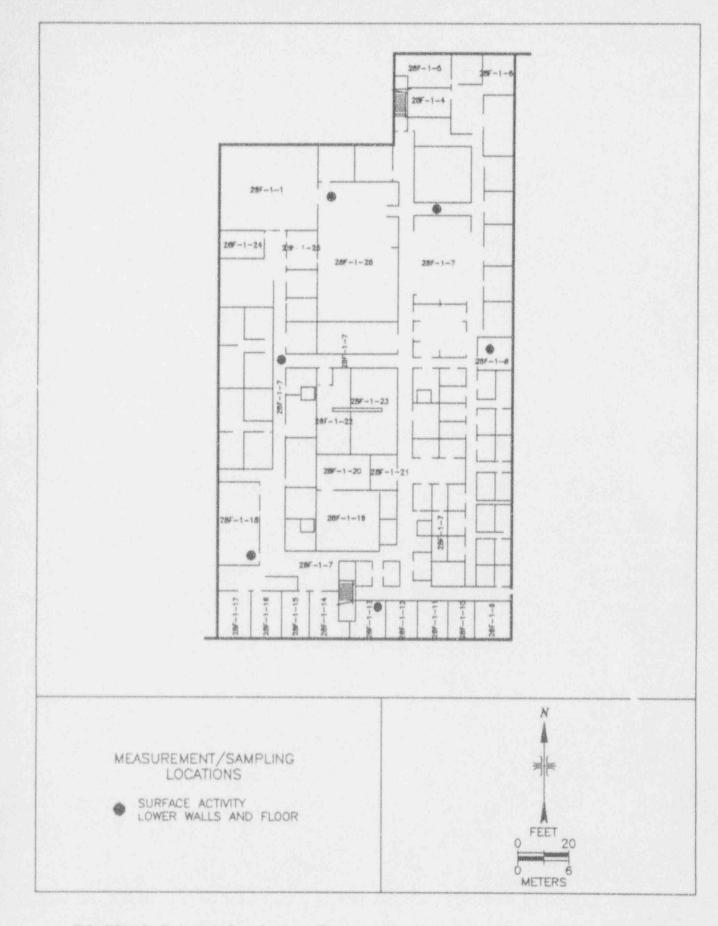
Building 8A, Second Floor - Measurement and Sampling Locations
